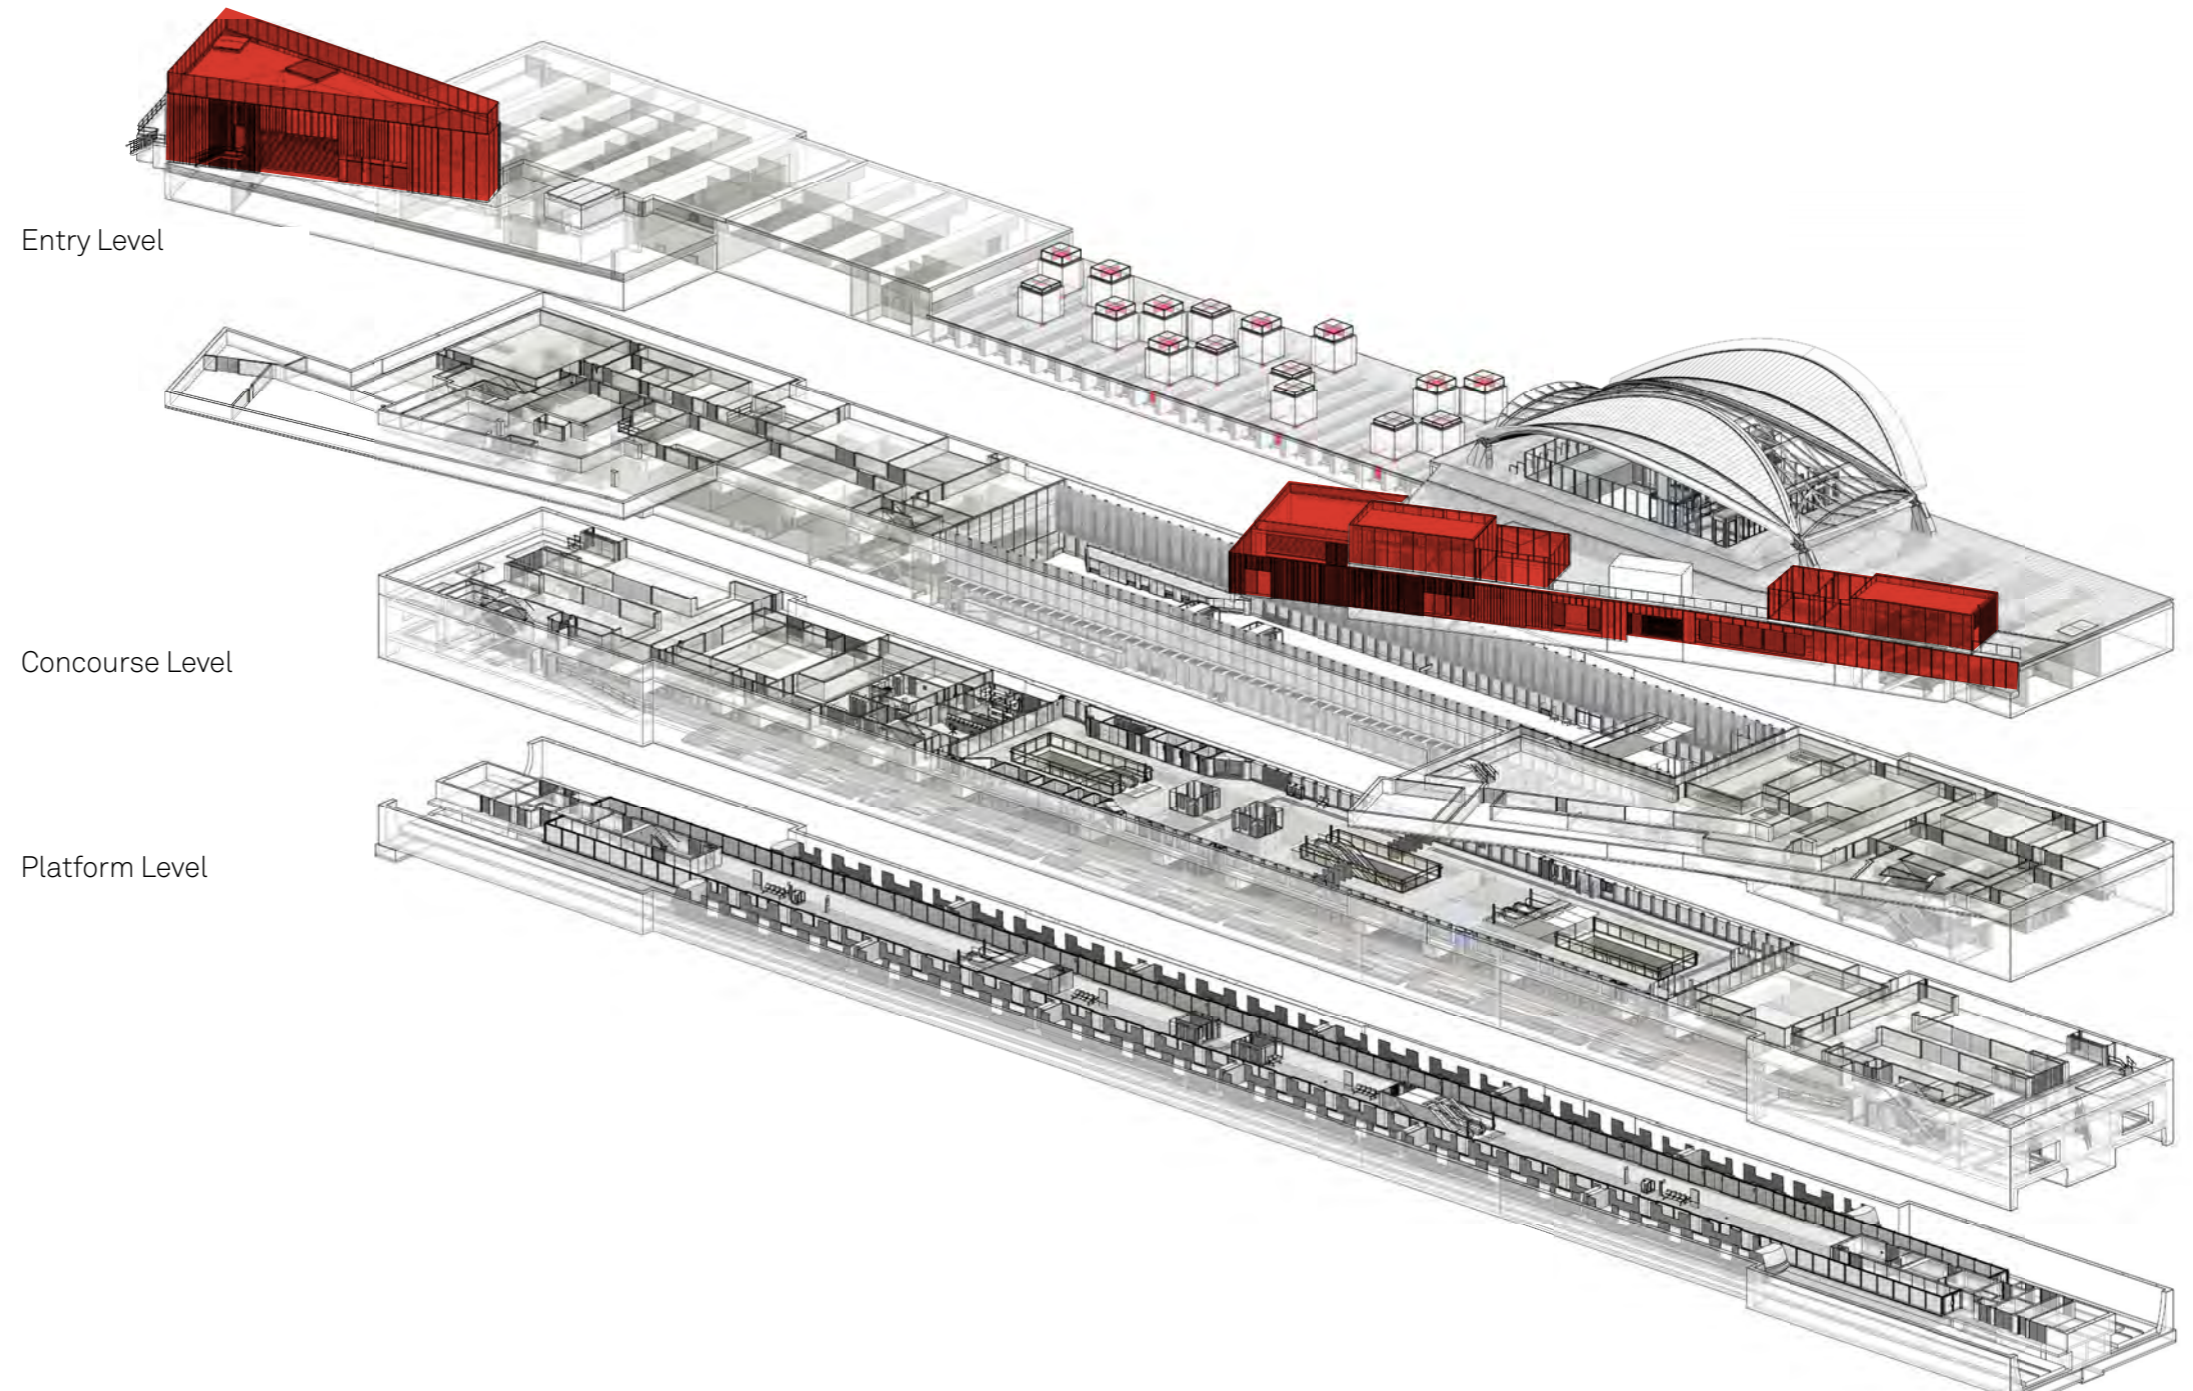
CSH\_Location of Service Buildings at Castle Hill Station. Source: HASSELL.
